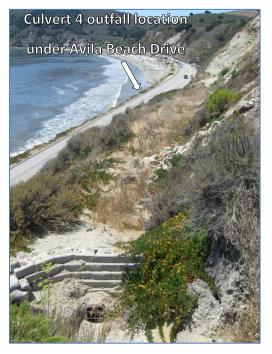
Culvert 4 in Culvert Collection Basin 2 that conveys flow down the coastal bluff (under an abandoned access road/erosion control terrace) to a series of standpipes before crossing under Avila Beach Drive and emptying into the ocean, facing west.
